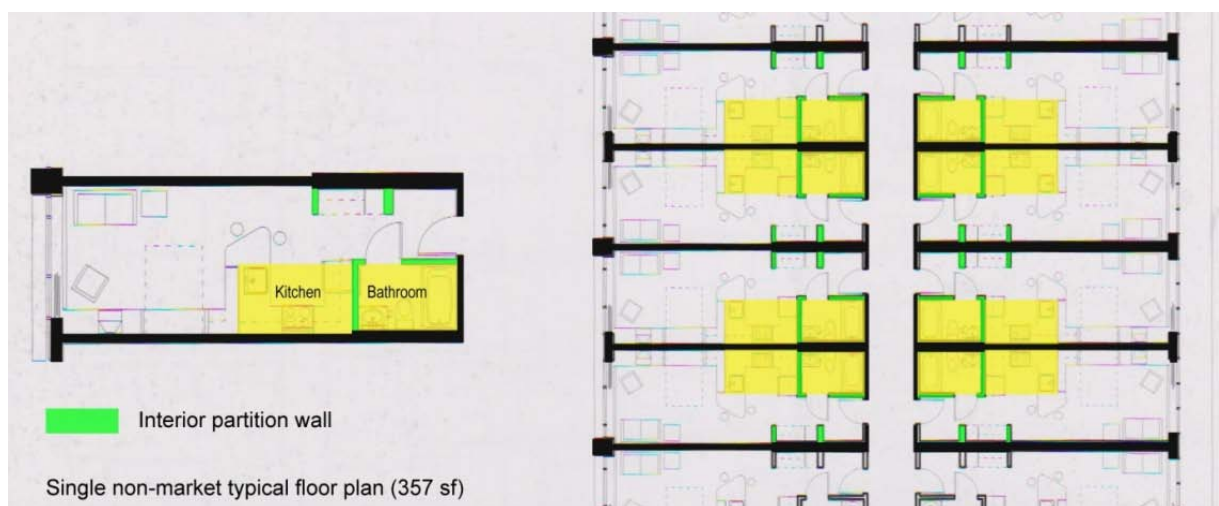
Single non-market unit floor / unit plan (After: Enright, 2010).
